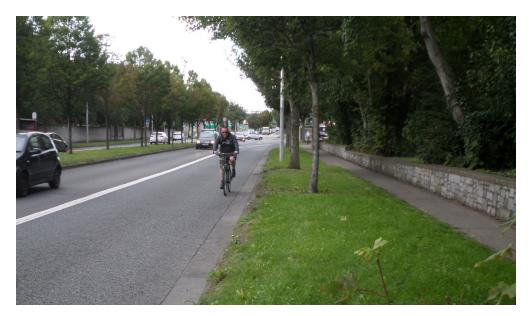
Existing Road Layout in Section 1 on the eastern side
